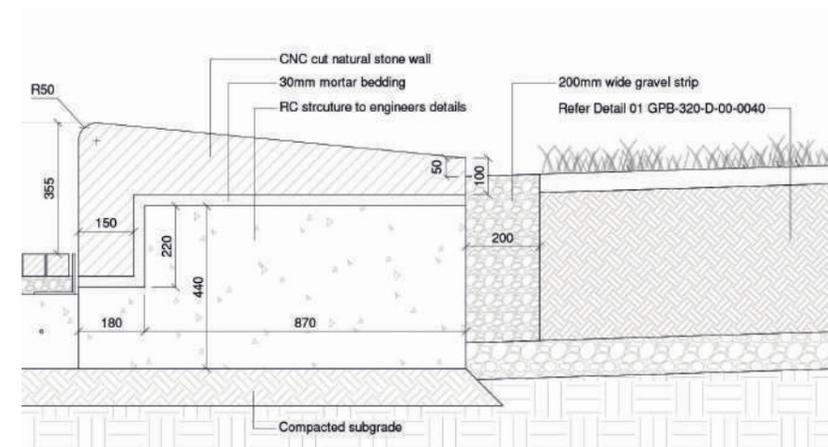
STONE BENCH ALONG THE MAIN PATH TYPICAL DETAIL
